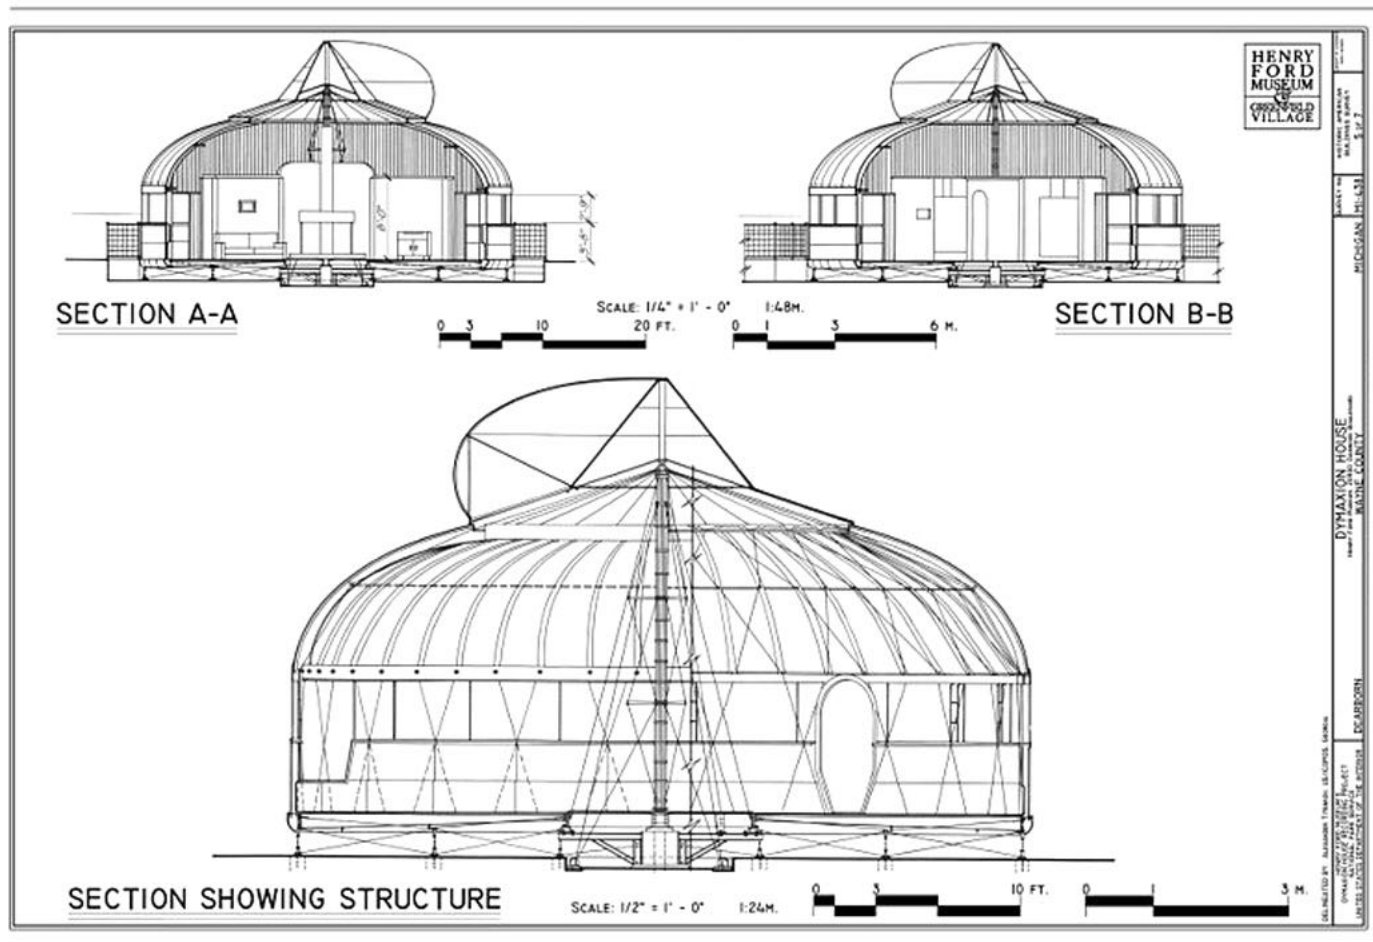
Elevation and Section Elevation Drawings for reassembly of the Dymaxion House at the Henry Ford Museum. Courtesy of the Henry Ford Museum. It shows how the central mast rises to the implied peak of the roof inside the ventilator shell. The tension rod "X-braces" appear all along the outer wall. The radially-ribbed arrangement of the aluminum roof panel structure shows how it appears to suspend the perimeter wall hoop, which the X-braces hold in position.
